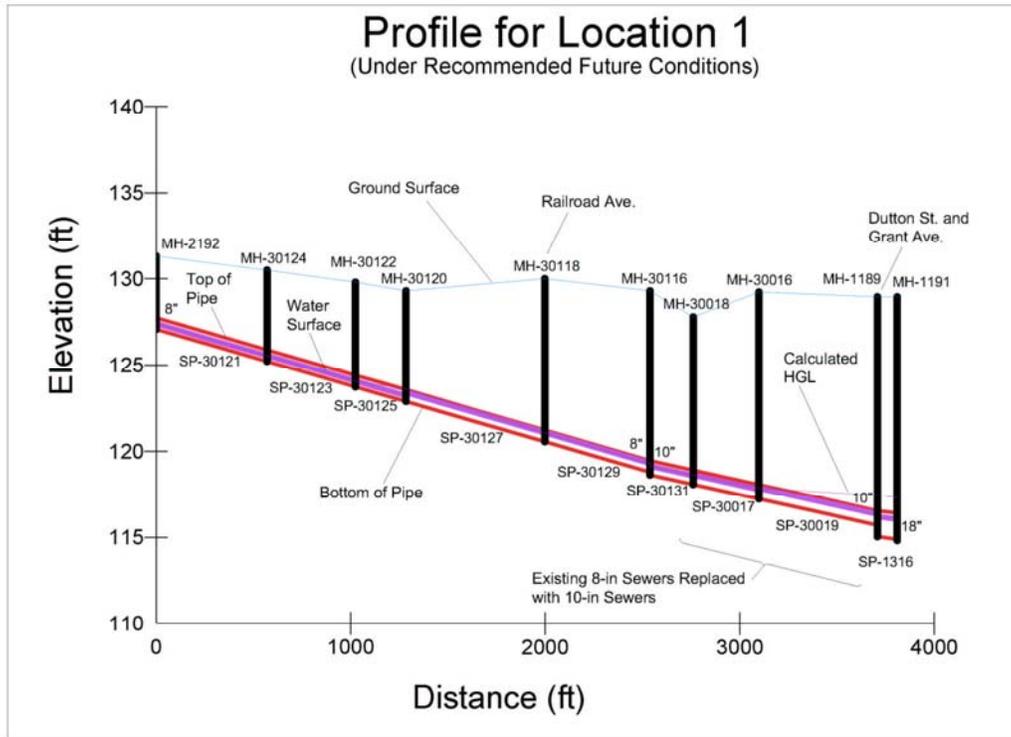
shows conditions after the reconstruction of the existing sewers in Dutton Street.
